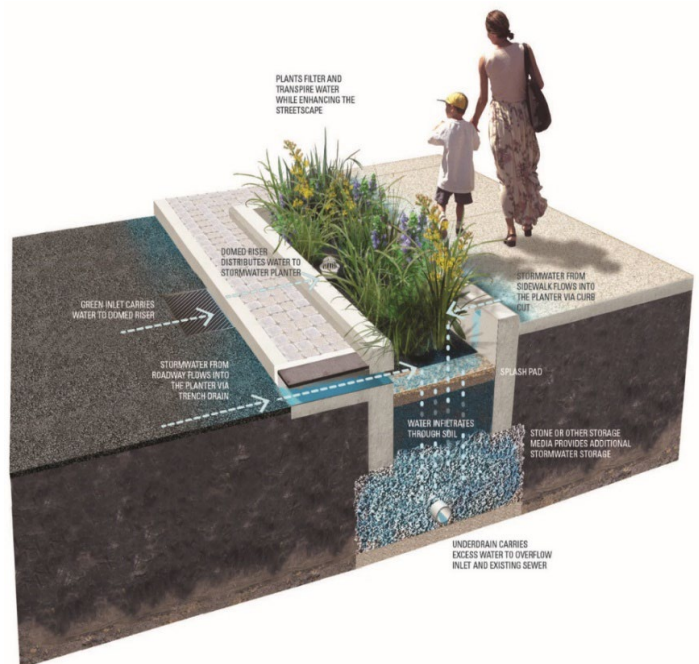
Stormwater Planter, Source: Philadelphia Water Department
